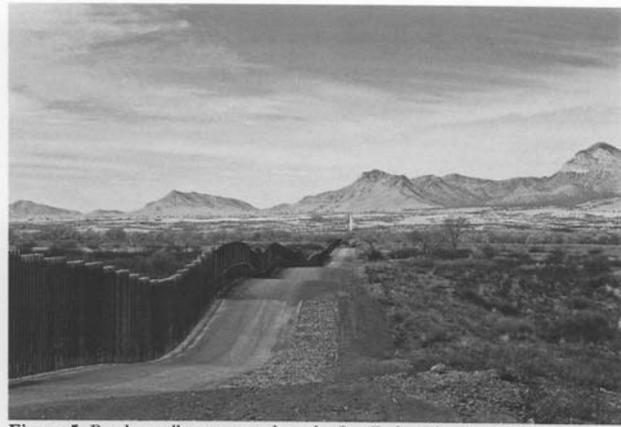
Border wall constructed on the San Pedro Riparian National Conservation Area (Taken on 3/17/08)
